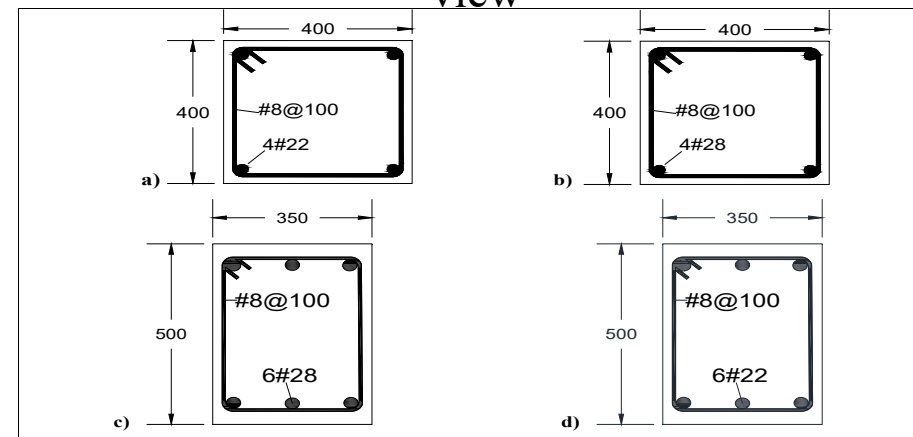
Cross Section Details of VP Series a) Column of 1st to 5th floor b) Column of the technical floor c) Beam 1st of 5th floor and d) Beam technical floor.
